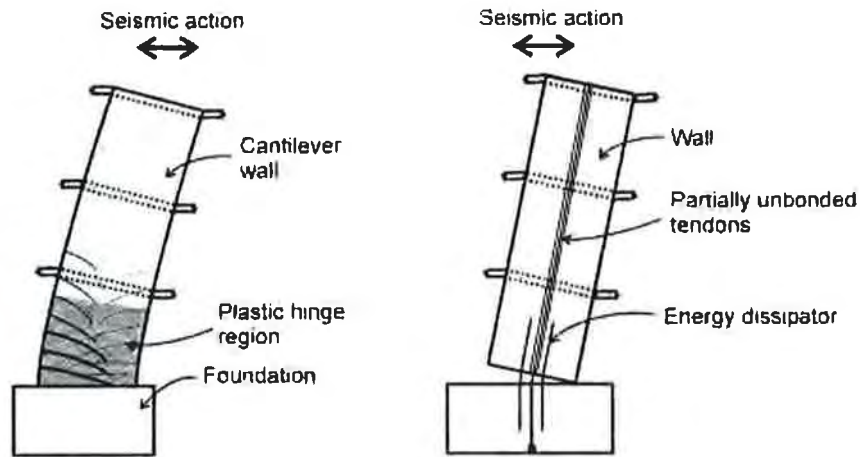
Comparison of monolithic wall and jointed precast rocking wall (after fib, 2003).
